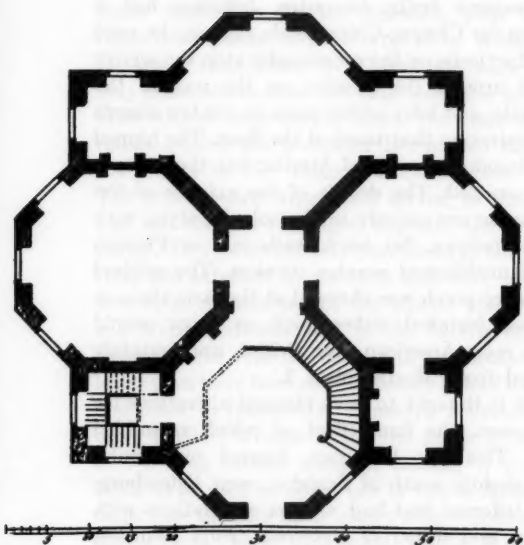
Plan for a hilltop house, *Select Architecture*, plate 30.
